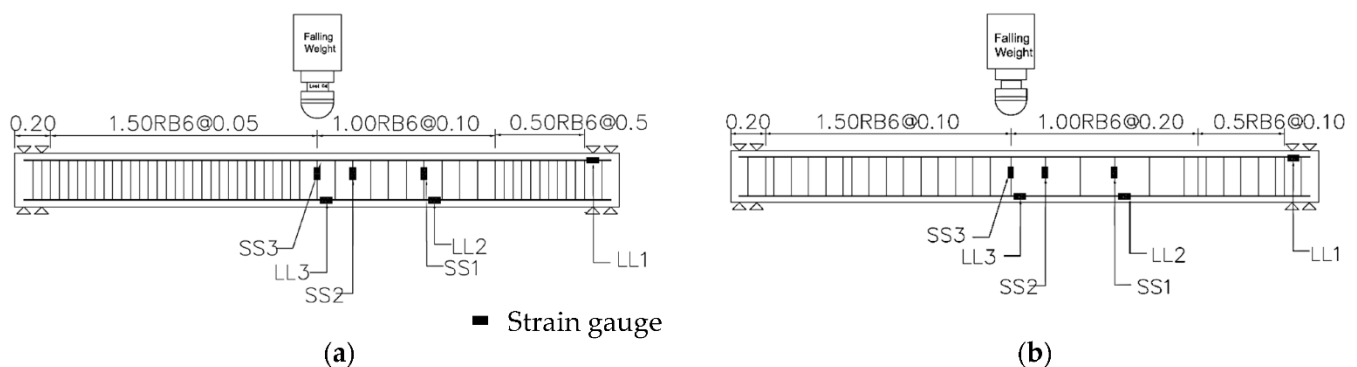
Dimensions and strain gauge locations (unit: m): (a) 100 mm stirrup spacing; (b) 200 mm stirrup spacing.
